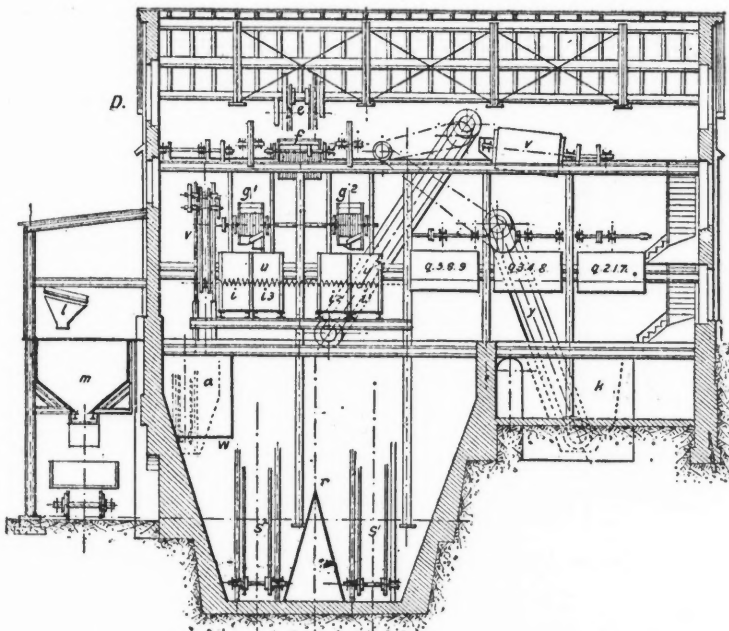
SECTION C D. COAL WASHING PLANT AT ZOLLEEN.
